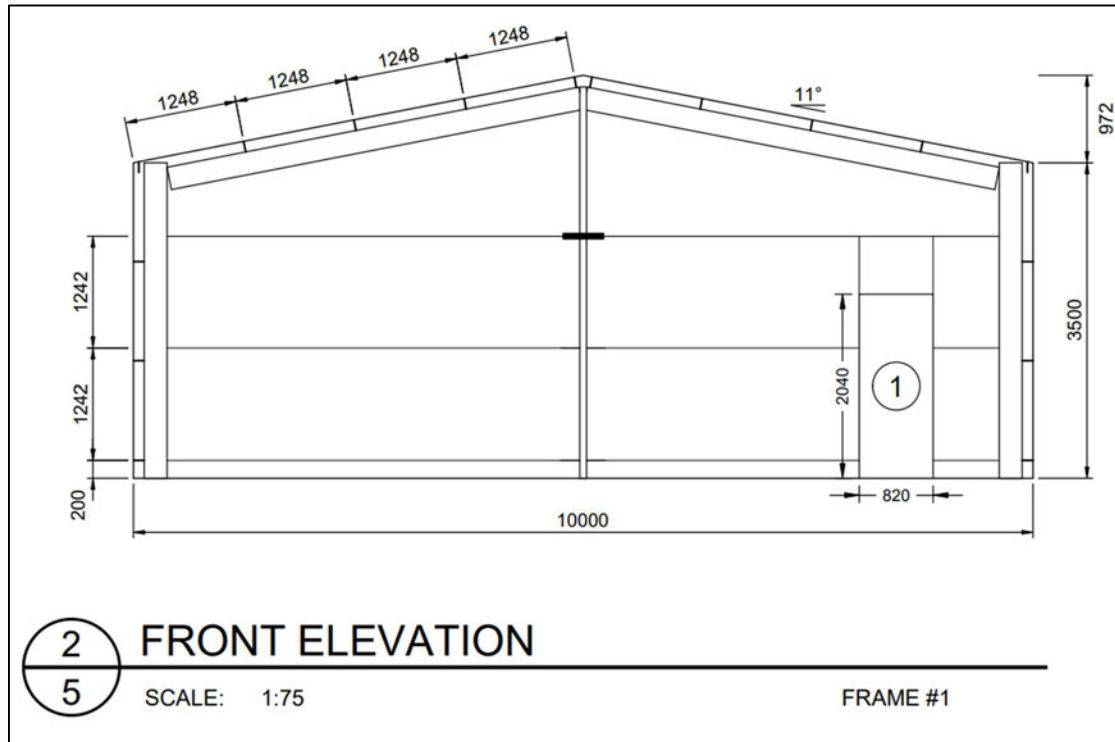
Front Elevation Frame #1 Prepared by Emerald Design and Construction (Appendix 2)
